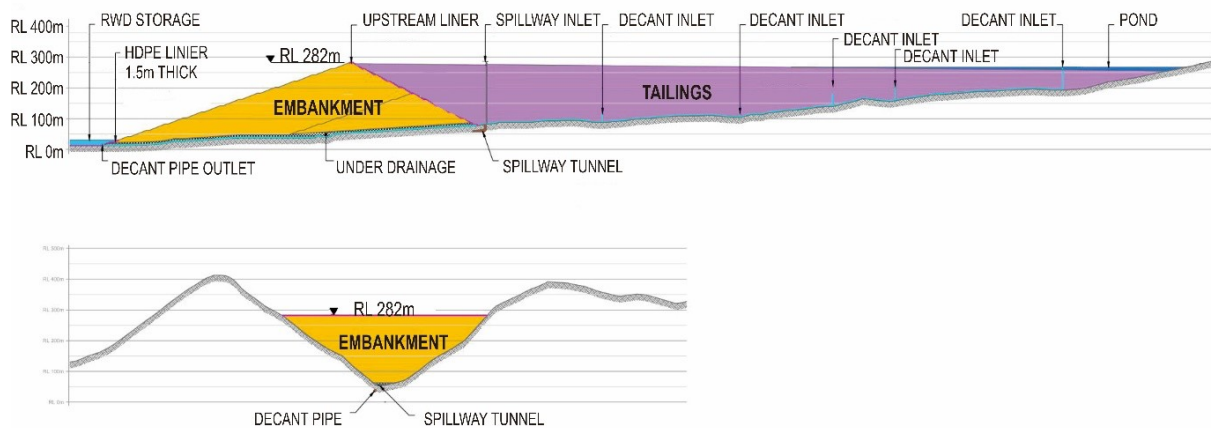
Longitudinal Section and a Cross-section through the TSF
